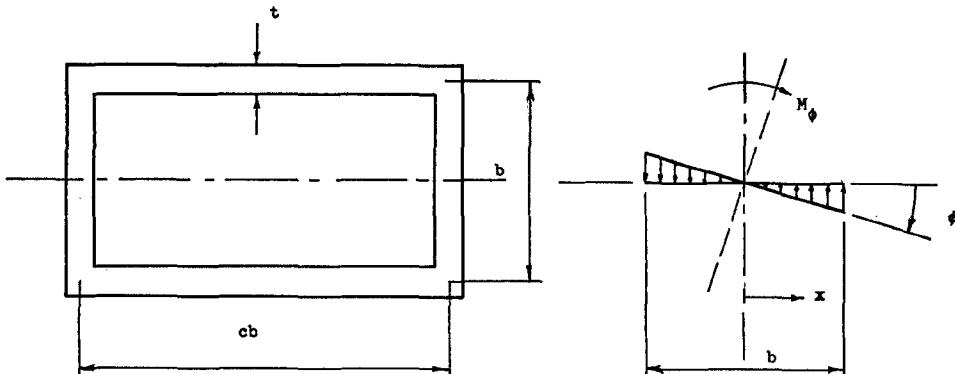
Foundation reaction due to rocking of a building with continuous wall footings.
